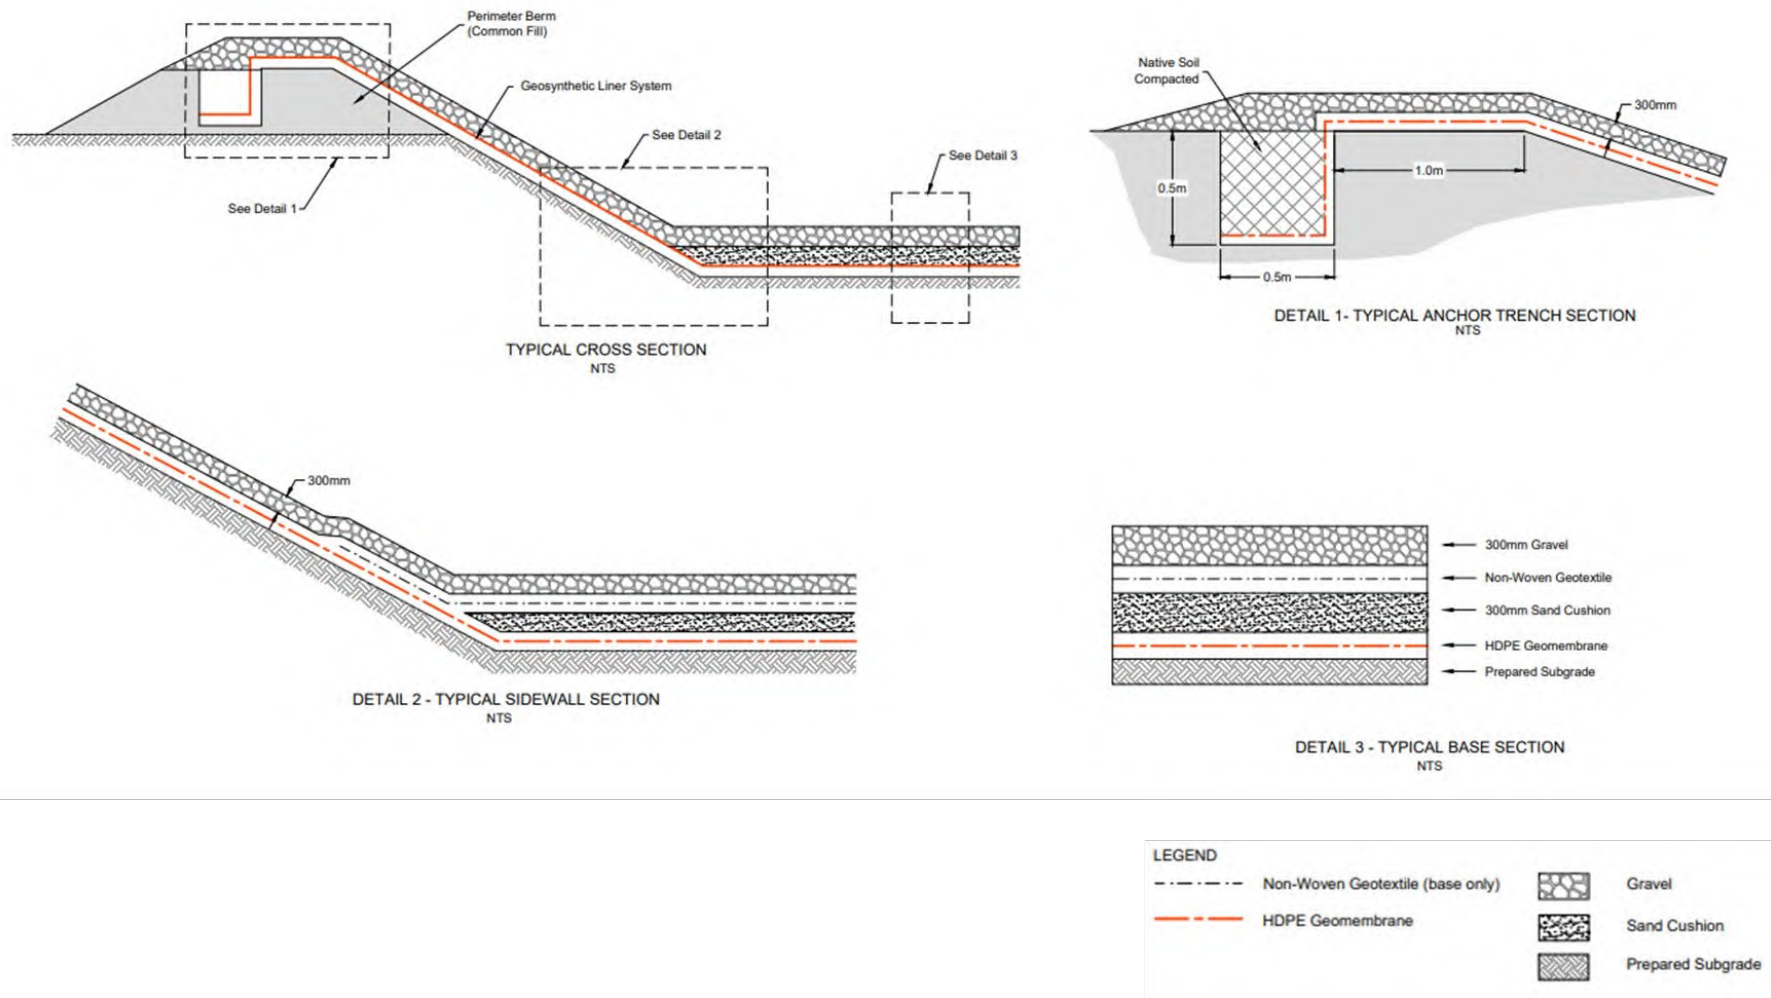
Single Geomembrane Liner Design Proposed for Clean Waste Rock Pad and Pond
